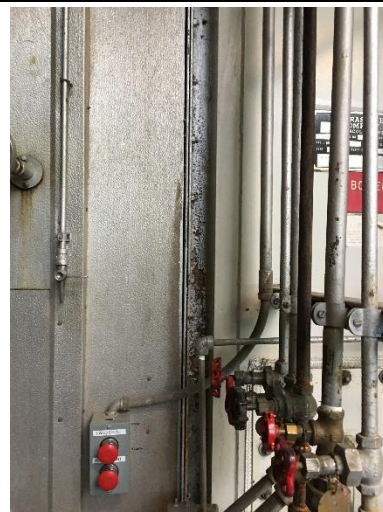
Building 2 Boiler Room – Silver Pipes
